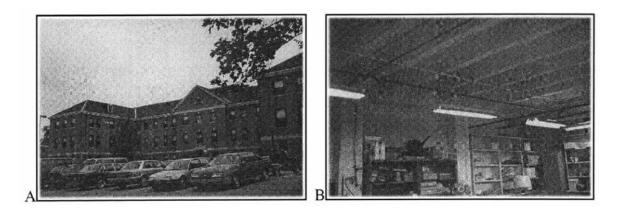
Schematics of Building (Techniques of Seismic Strengthening for Concrete Structures)
